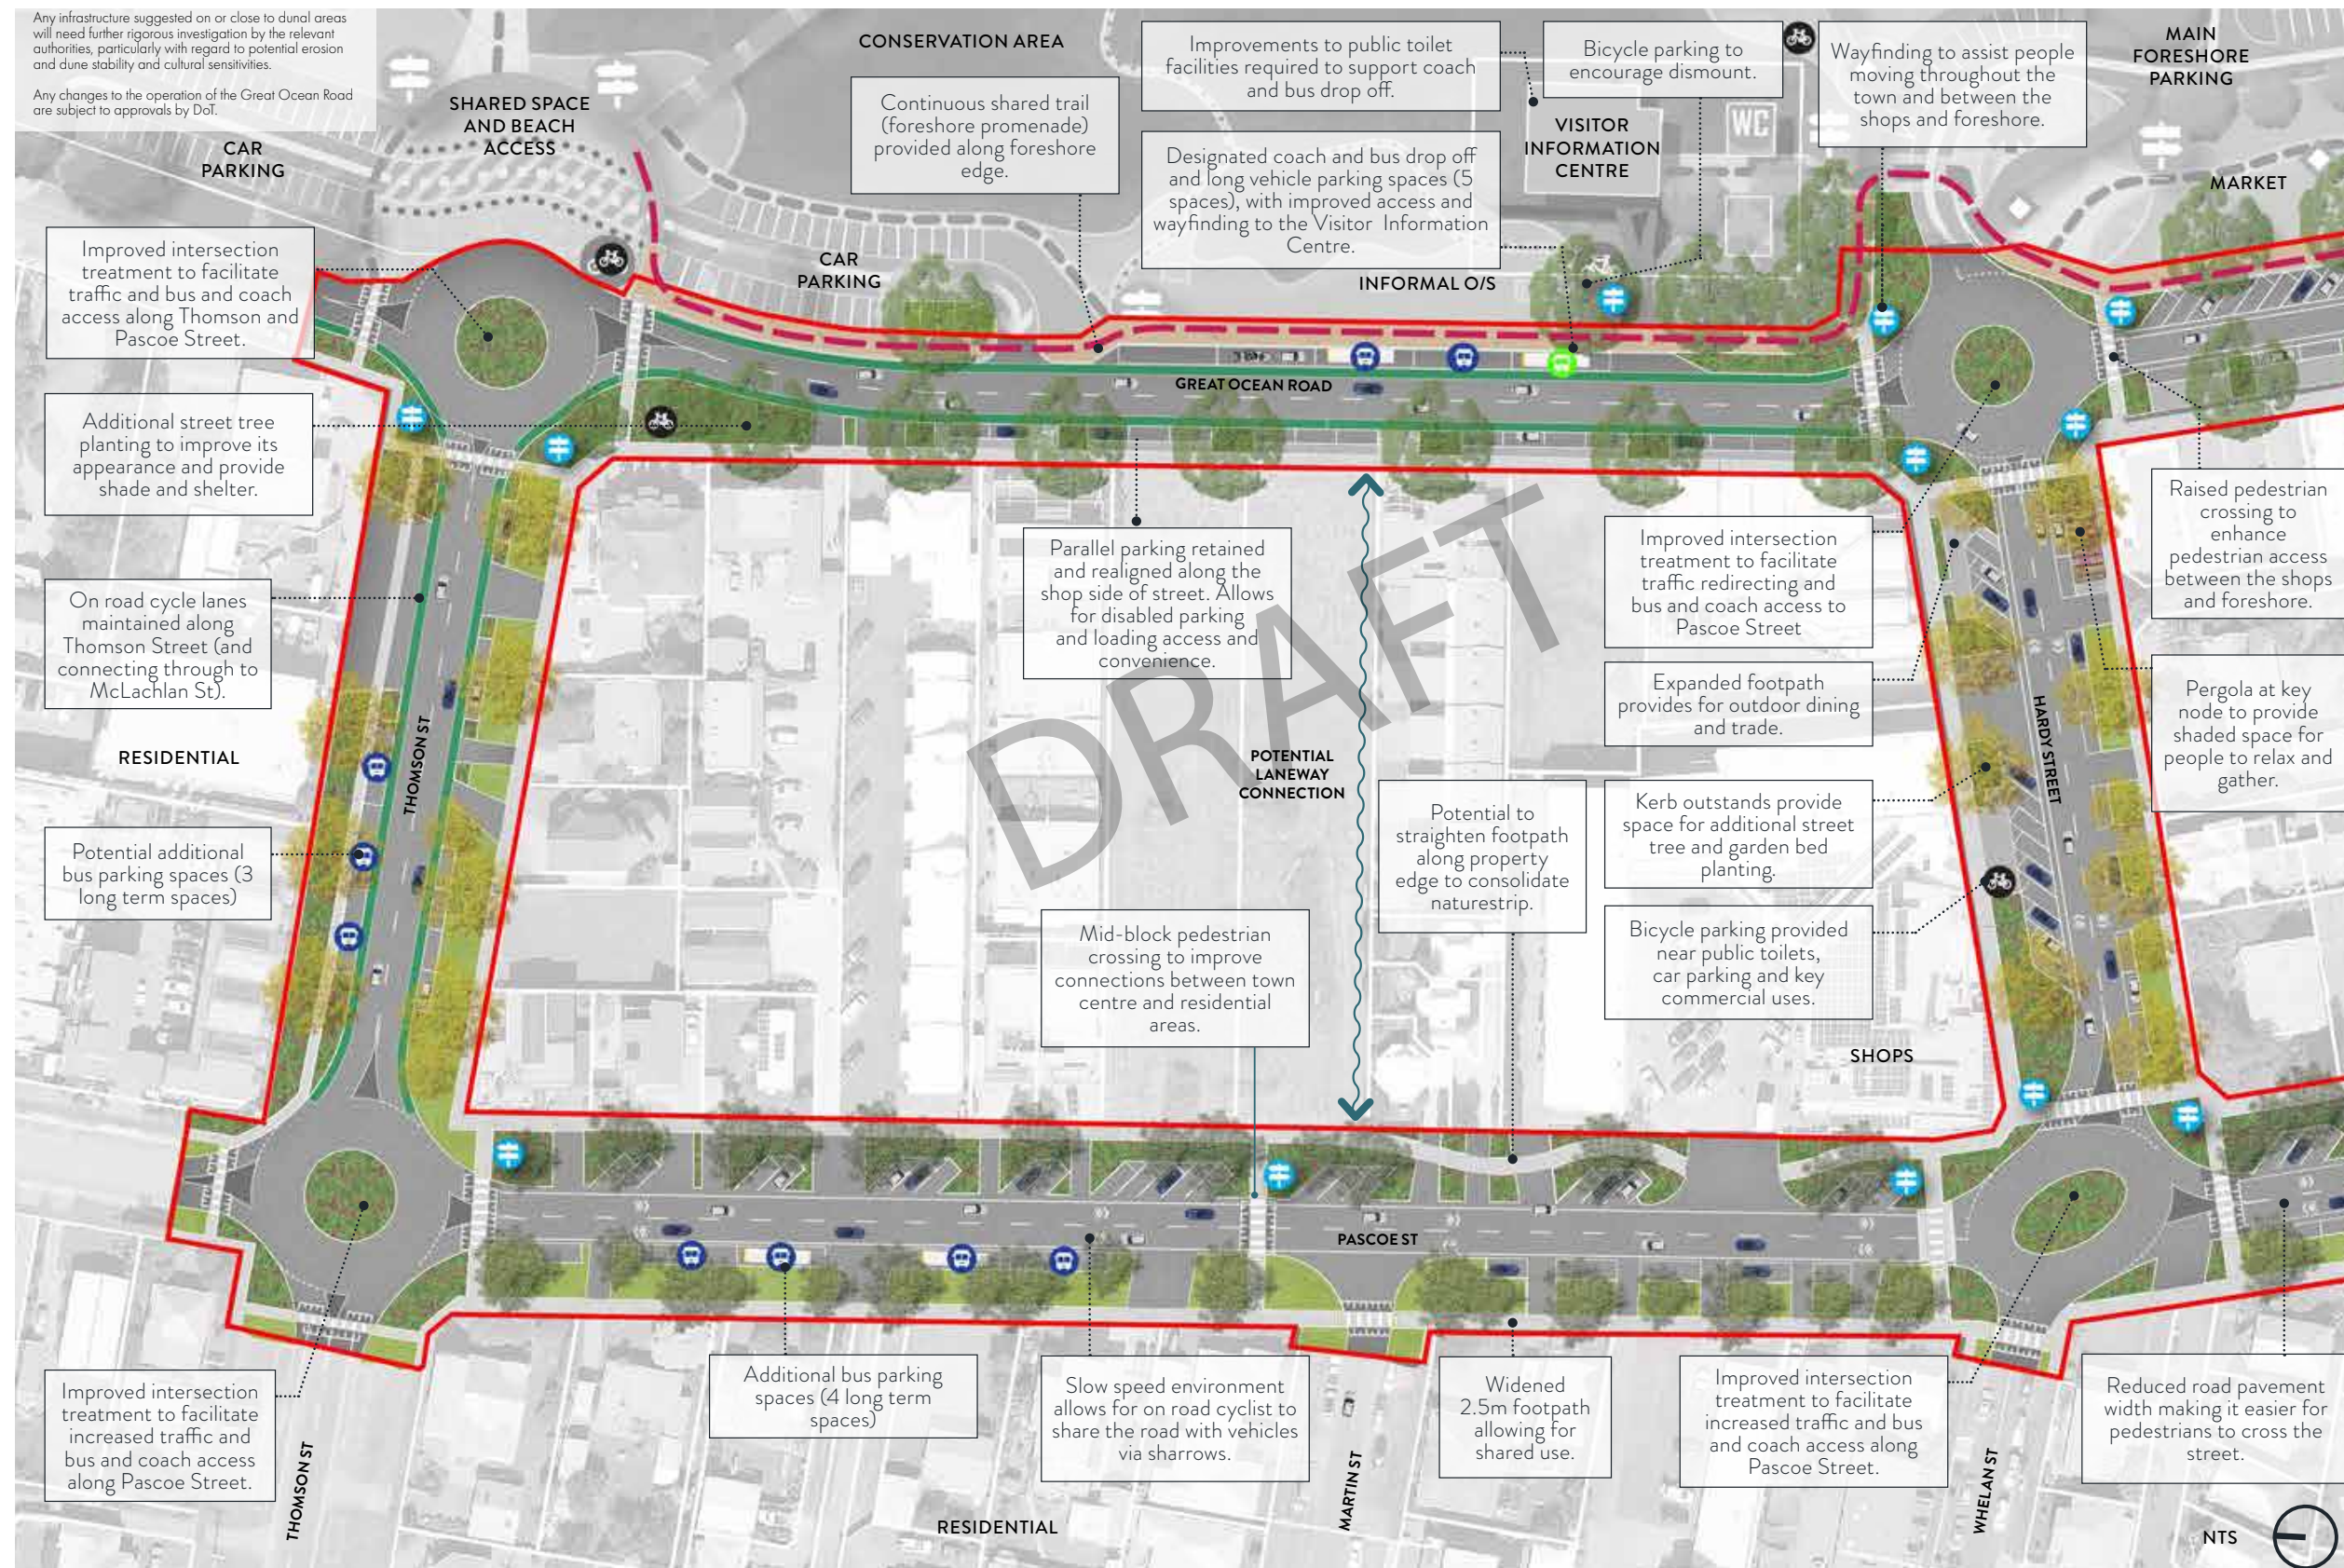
Detailed Streetscape Plan 1 - Option 1 - One-Way
